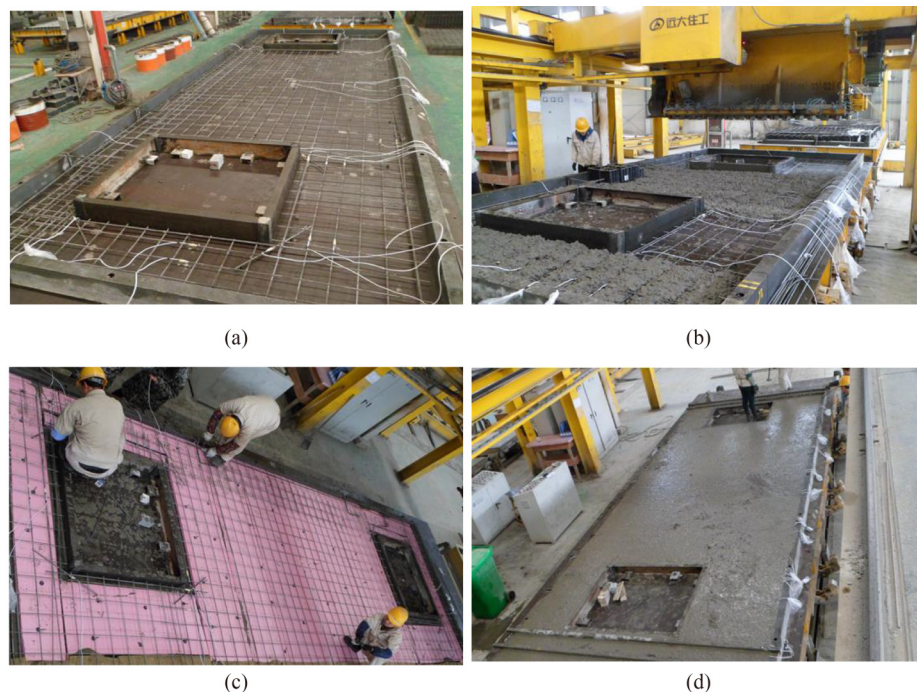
Fabrication process of the PCSP specimens in this study: (a) installing the bottom layer reinforcement; (b) pouring bottom layer concrete; (c) installing the XPS insulation, connector, and top layer reinforcement; (d) pouring top layer concrete.
